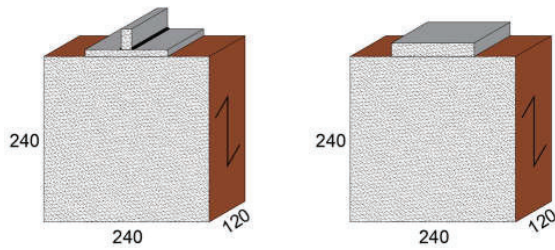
Detailed geometry of the specimens, including T-stub and glulam, the DIC painted front face and positions of (a) T-stub specimens and (b) Reference specimens. Dimensions in mm.
